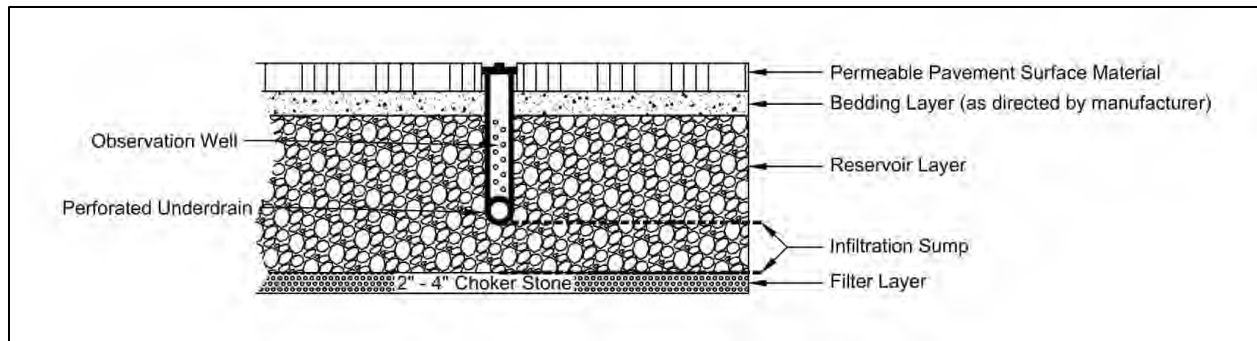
Cross-section of an enhanced permeable pavement design with an underdrain.
